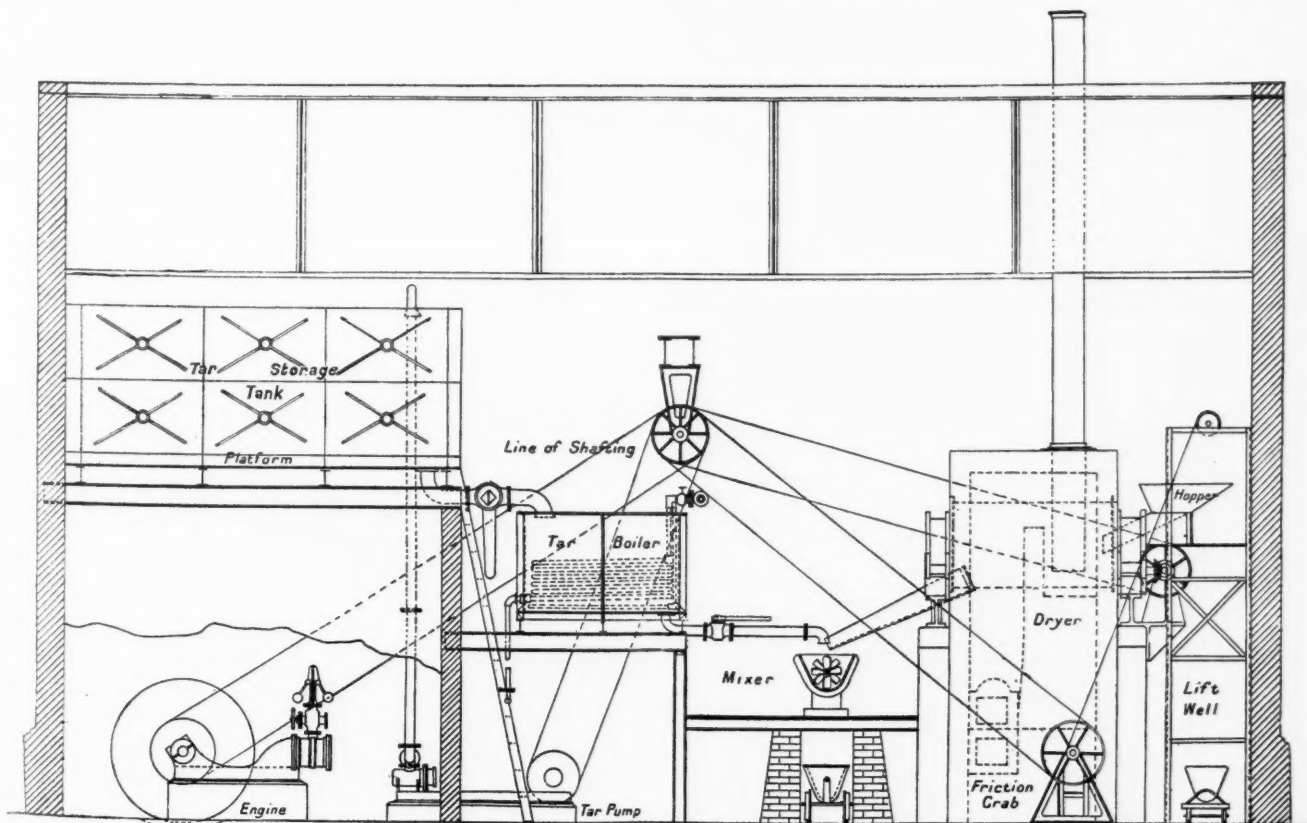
LONGITUDINAL SECTION OF PLANT SHOWN IN FIG. 4
